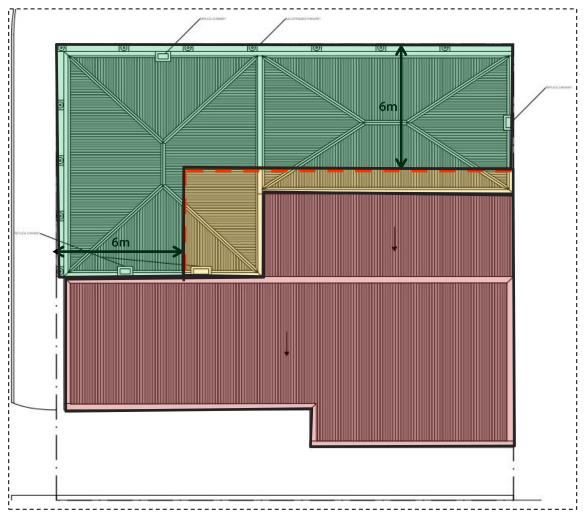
Roof plan of former hotel (Source:WBa). Red dashed lines, colour and dimensions added by Tract.
